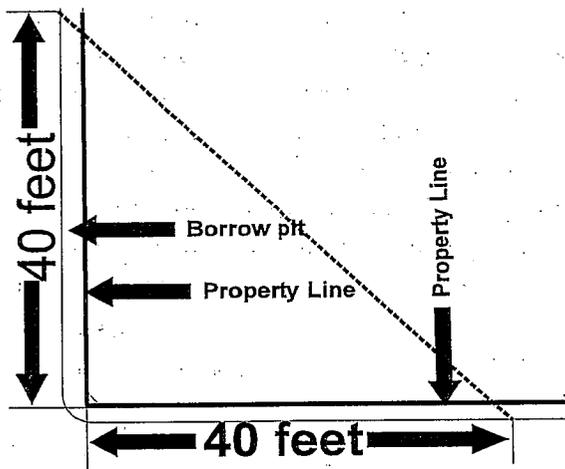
Clearview of intersecting roads, 40 foot clearview zone without sidewalk, curb and gutter.
